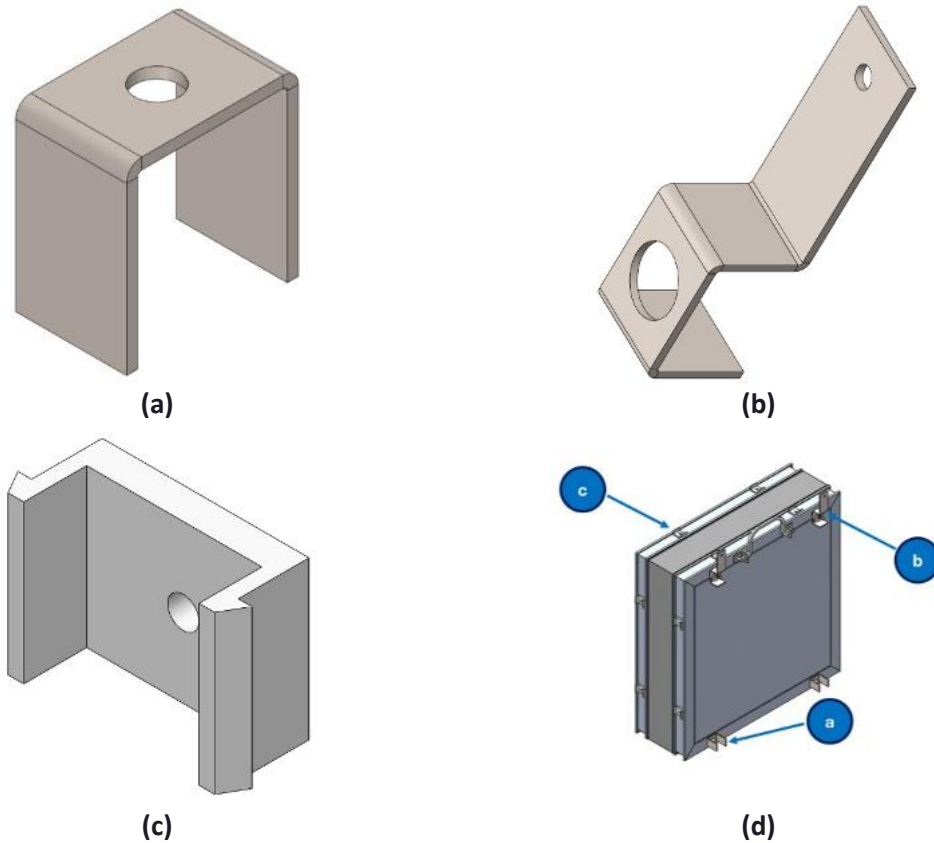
The specific elements used for the connection of the prefabricated component. (a) Support and link between the component and the external wall, (b) connection link between the component and the external wall, (c) connection link between two consecutive components, and (d) their place on the component.
